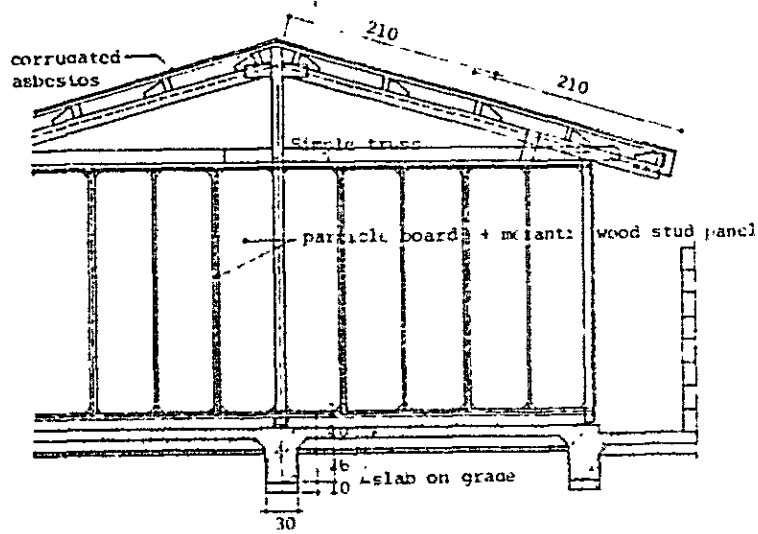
EXISTING WALL SYSTEM OF PERUMNAS HOUSING
